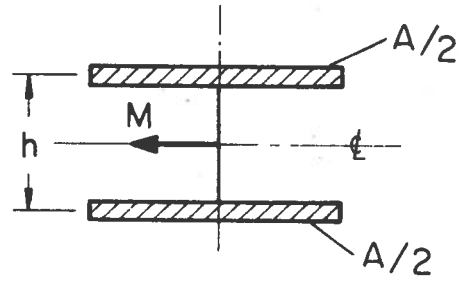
CROSS SECTION OF IDEALIZED H-SECTION BEAM
